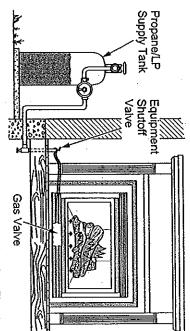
Checking Gas Joints for Propane/LP Gas Fireplace
